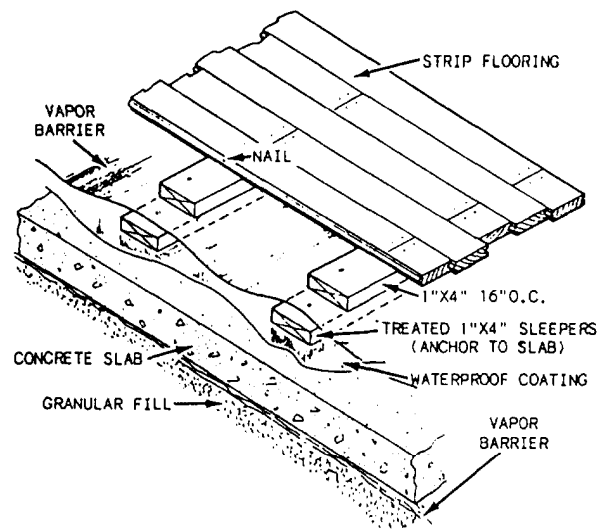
Base for wood flooring on a slab with vapor barrier.
